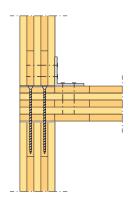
Joint between wall panel and floor slab using angle bracket.
